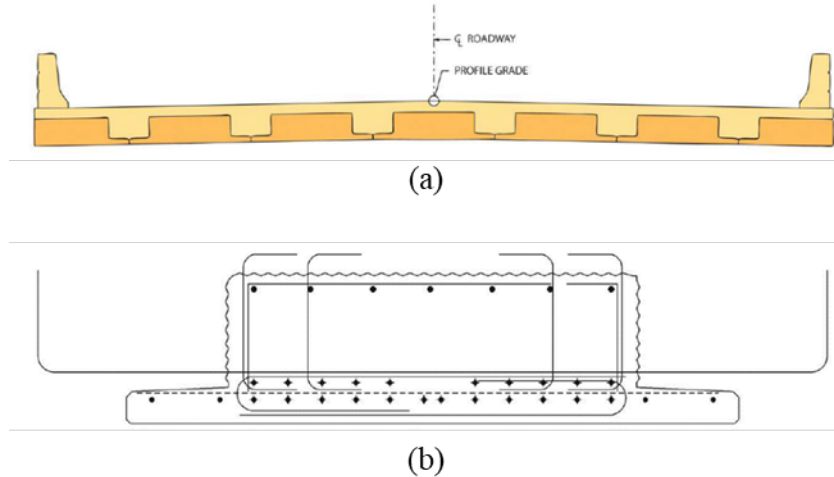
PCSS [11]: (a) typical transverse section of a bridge with PCSS system and (b) typical MnDOT PCSS.
